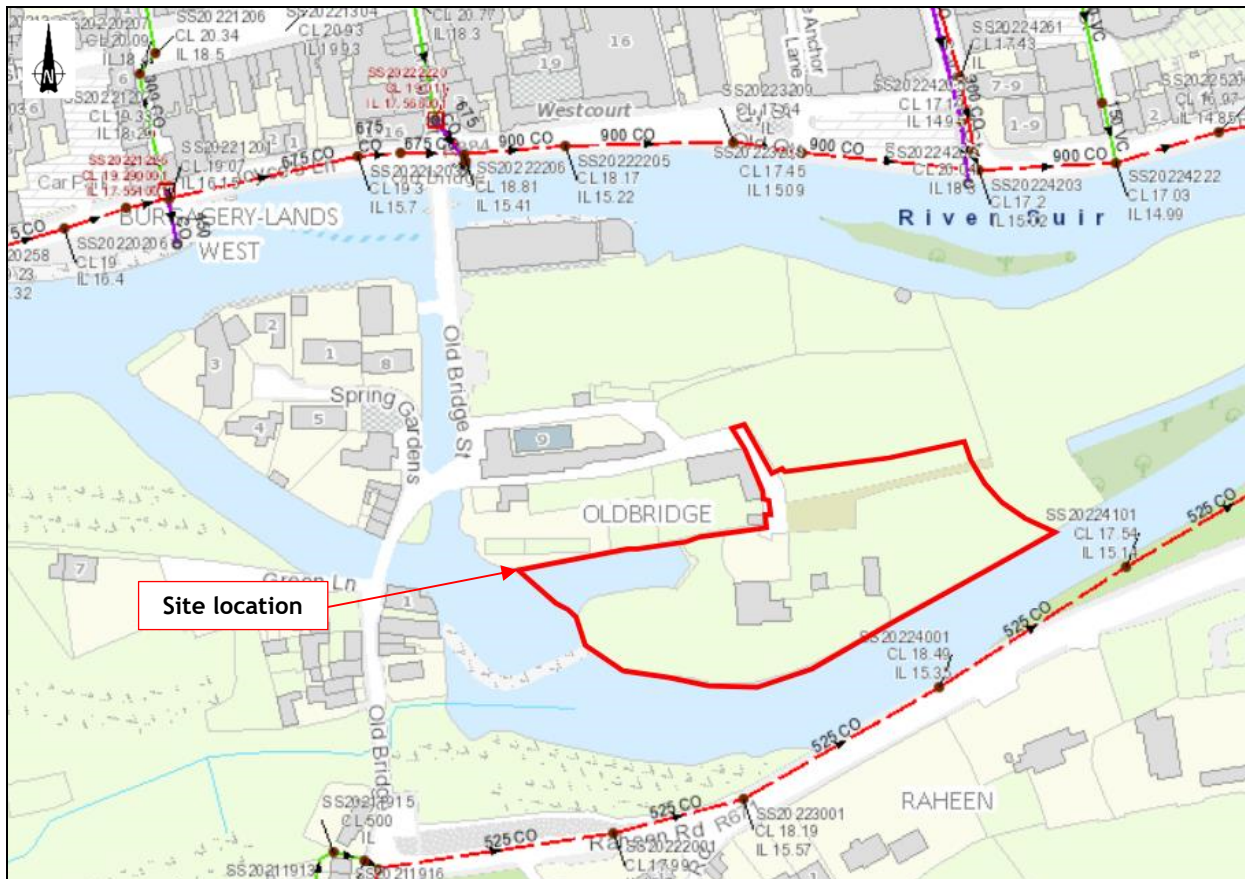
Existing stormwater drainage surrounding the site (Extract from IW records)
